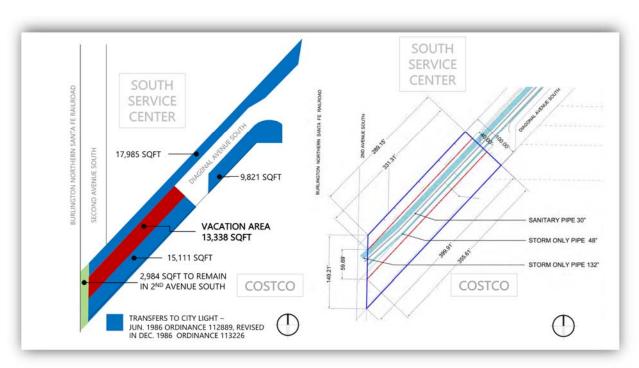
Vacation site details and dimensions. Underground utilities are shown.
